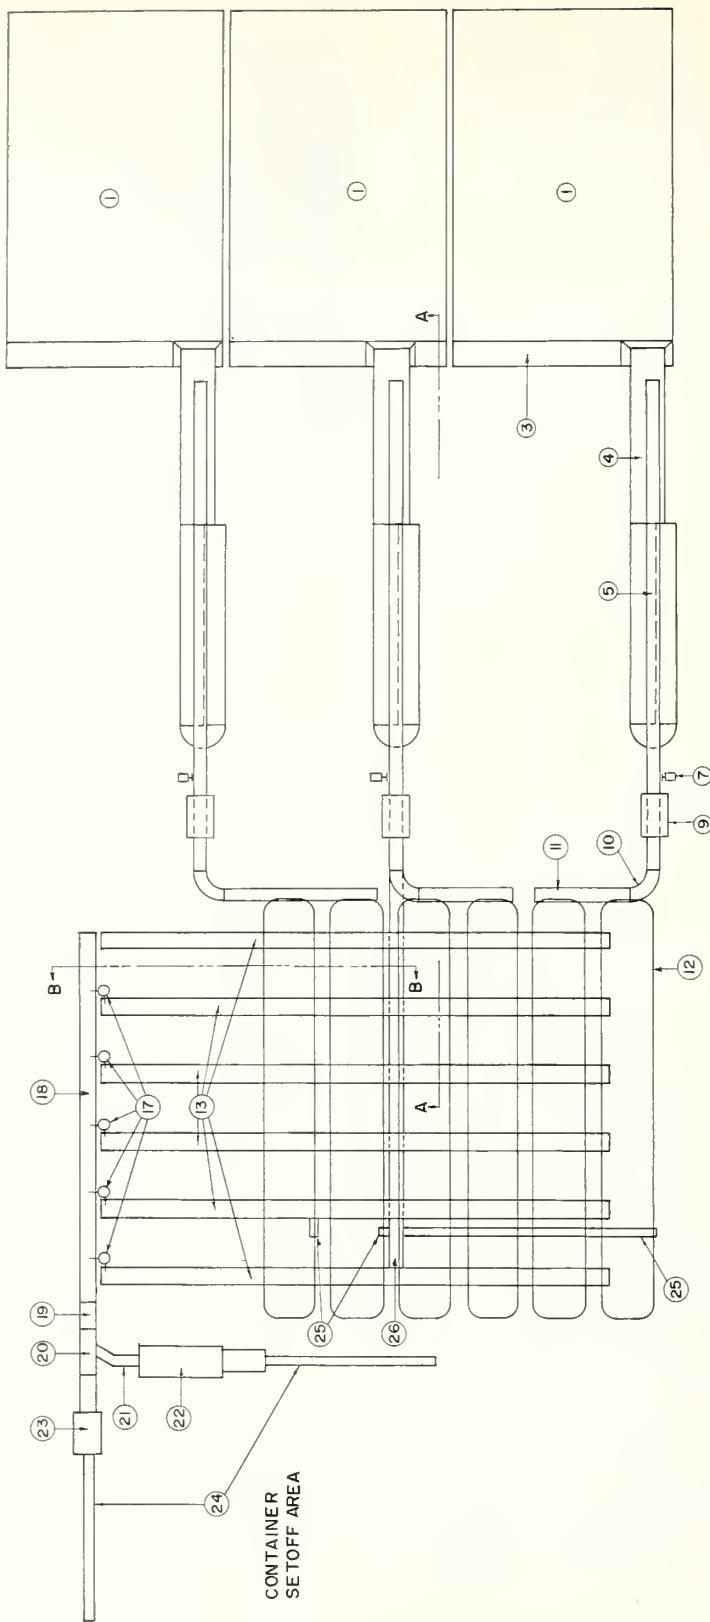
Packing-line layout for monorail conveyor sizing equipment. (See figure 20 for elevations of sections and p. 18 for identification of numbered parts.)
